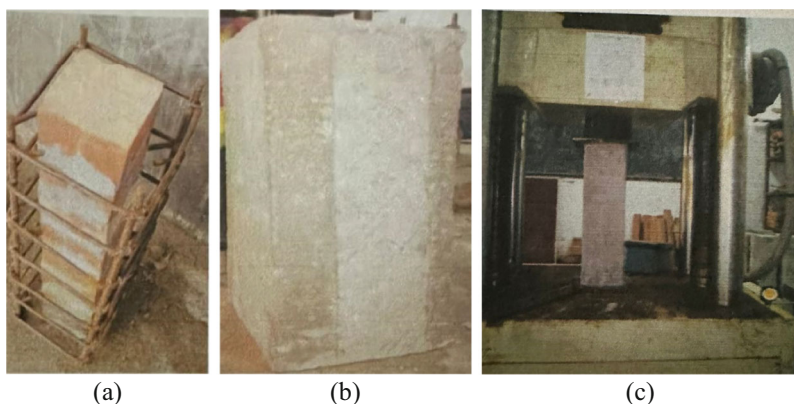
a Brick masonry column encased in reinforcement before casting, b strengthened brick masonry column, and c experimental setup
